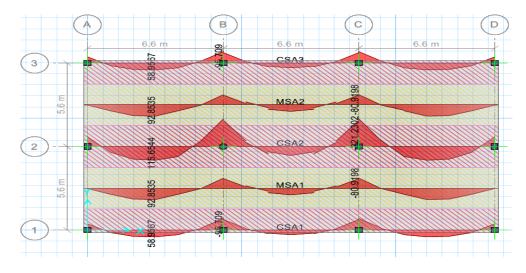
C.S & M.S along longer direction(SAFE:EC2, without staggered column)
